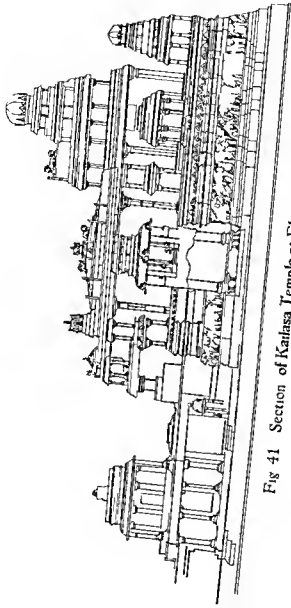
Section of Kailasa Temple at Elura (Burgess)
